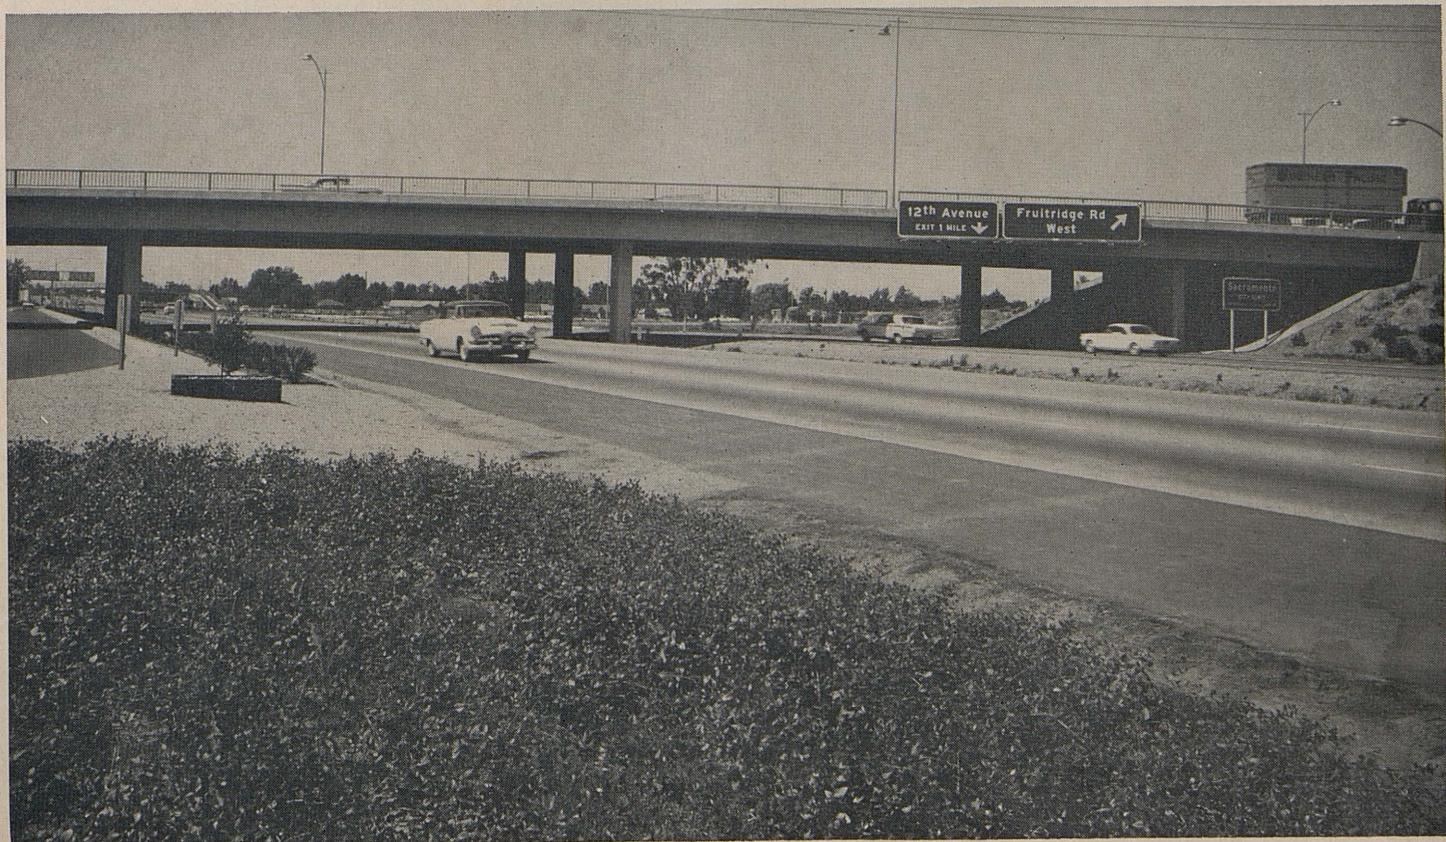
Freeway similar to Photo No. 2, but with mature roadside planting.
